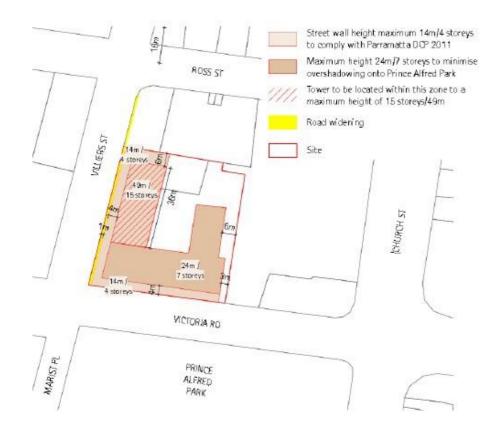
4.3.3.6.3 Built Form Design Controls – Heights and Setbacks
